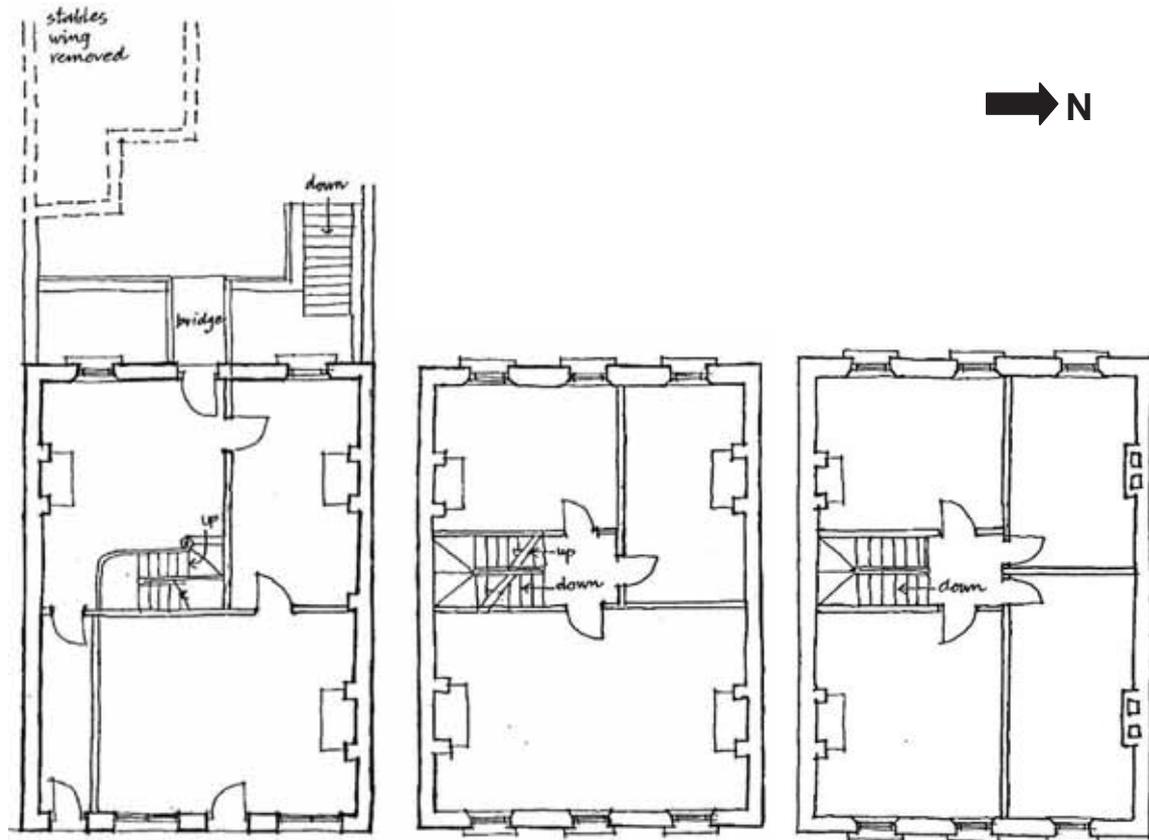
Reconstructed drawings showing likely floor layouts of the 1842 Hotel floor plans prepared by David Sheedy in November 1991 as part for the Conservation Plan study for the 73 George Street site. Ground floor plan to second floor plan from left to right.
